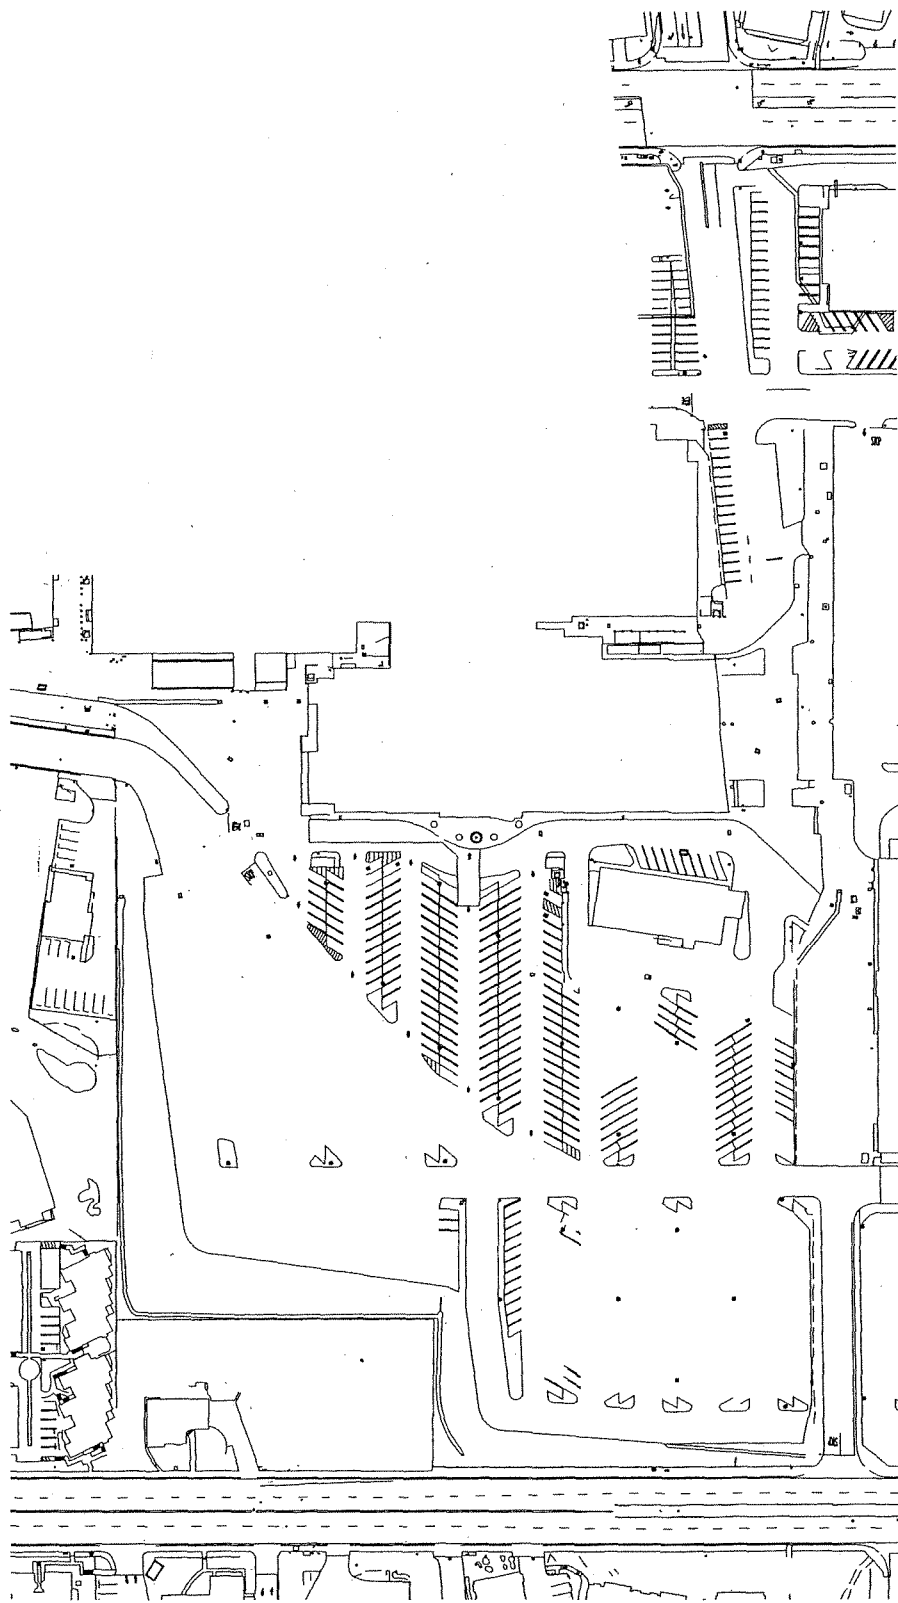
A depicts the existing site plan and Figure 3B depicts the proposed Walmart site plan.
